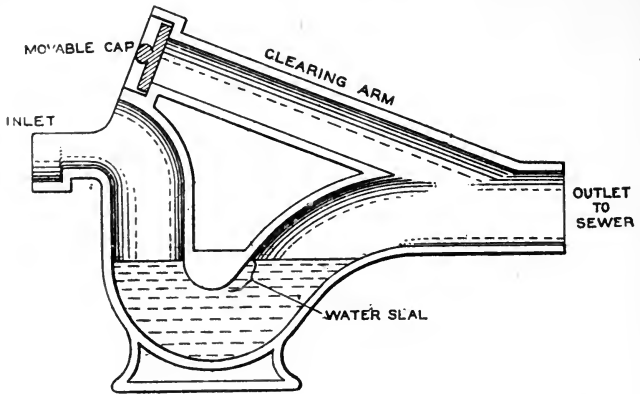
Intercepting trap shaped to allow of building into wall of manhole.
